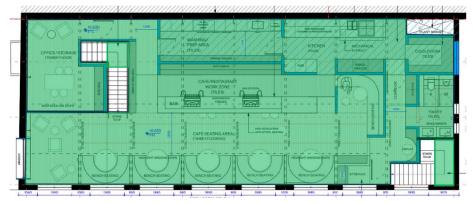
Ground Floor GFA calculation plan, with areas included as GFA highlighted in green.
